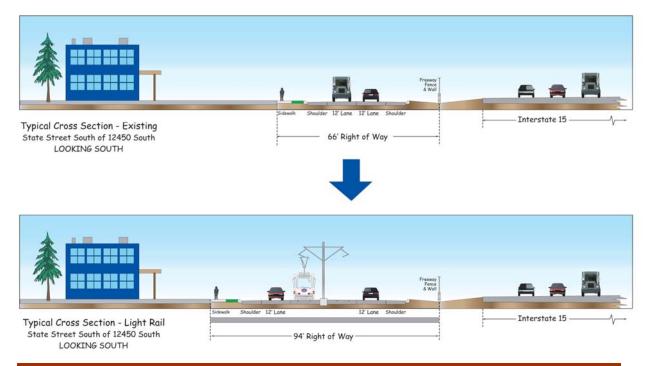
CROSS-SECTION OF STATE STREET ALIGNMENT WITH LIGHT RAIL TRANSIT
